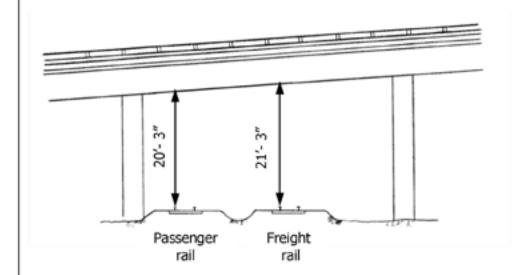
Bridge elevation view with one passenger rail and one freight rail track below the bridge.
